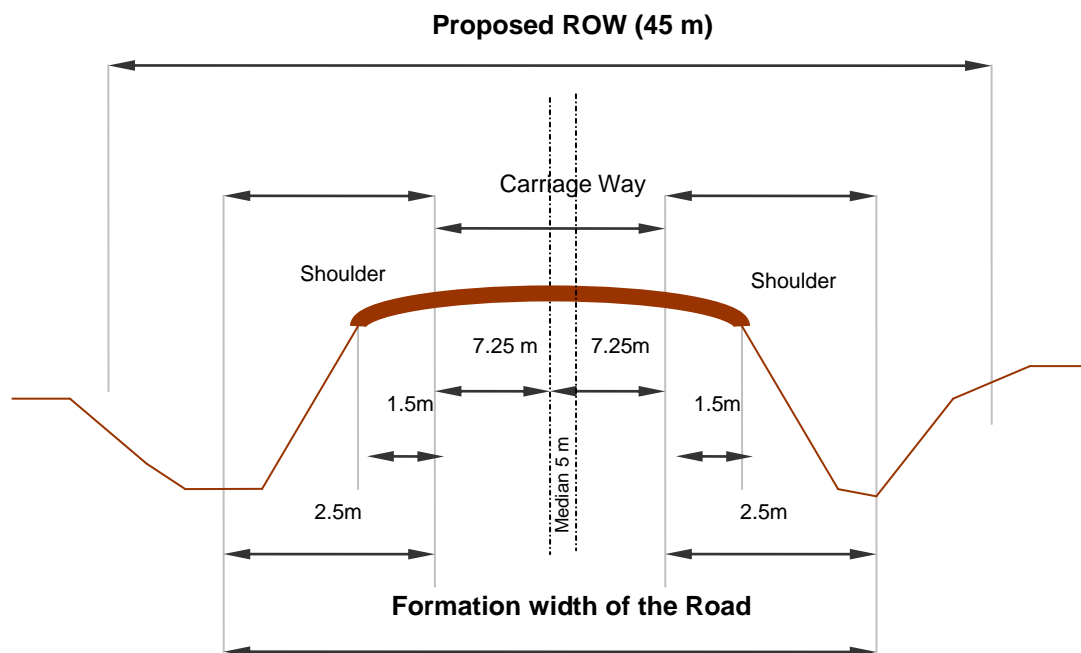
A cross section showing a typical Formation width of the Bypass Road
